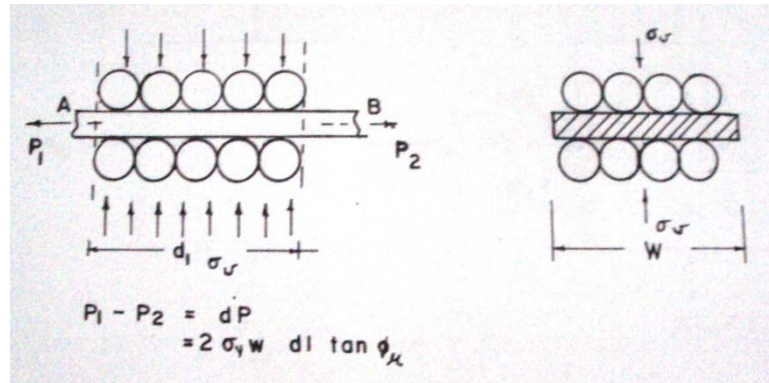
Stress Transfer By Soil Reinforcement^[13]
